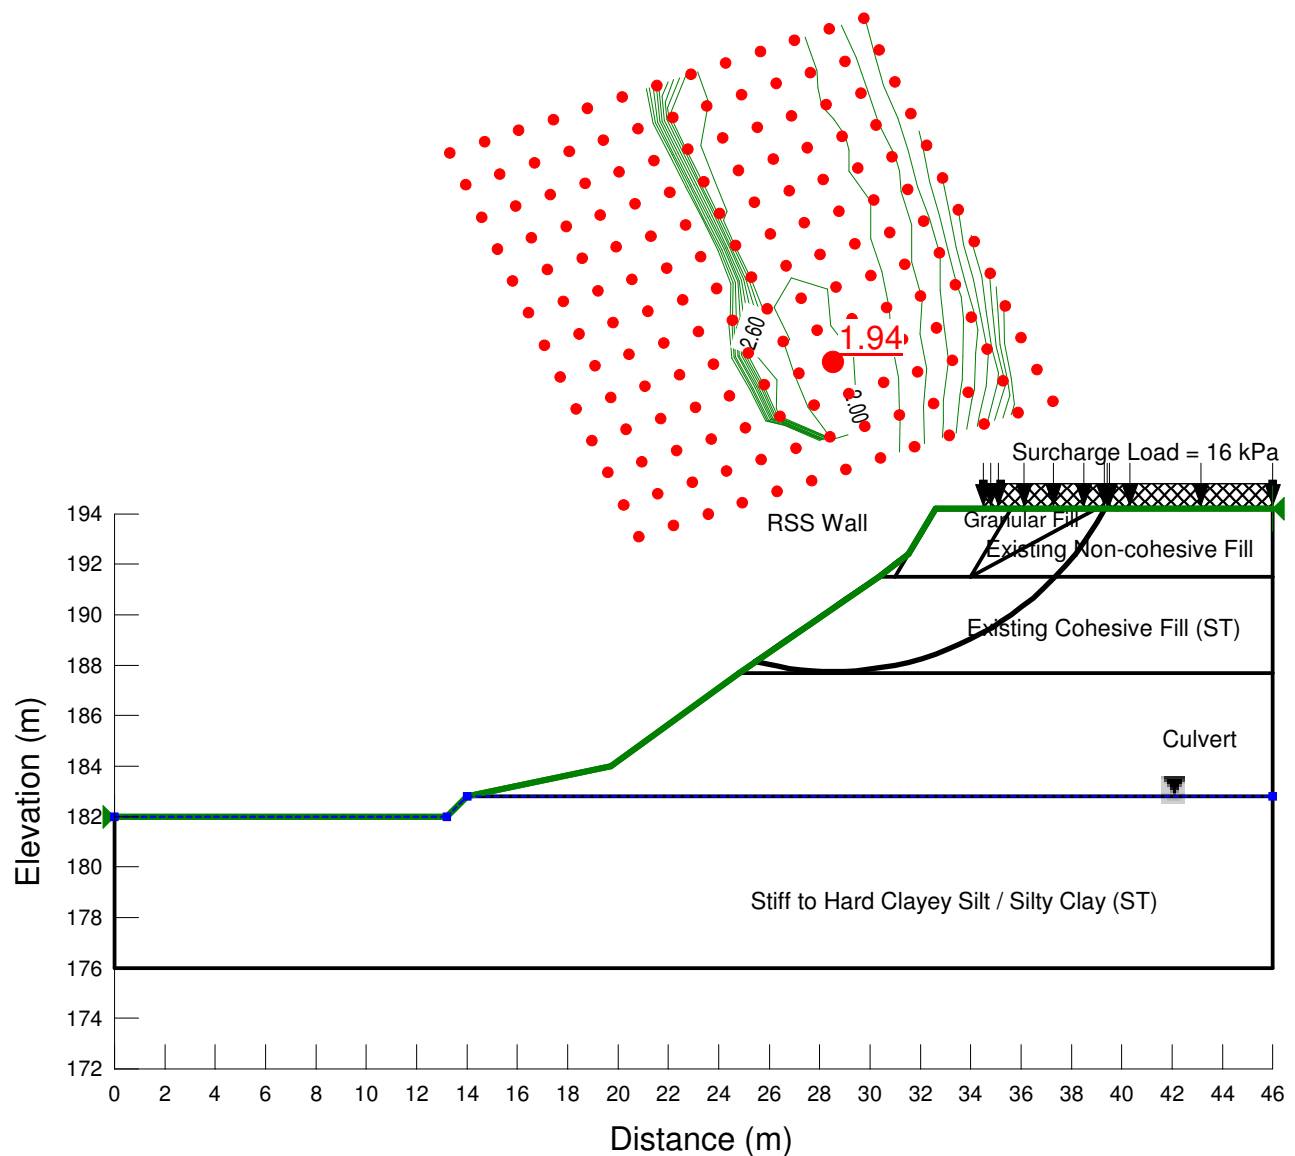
Slope Stability Analysis with Proposed RSS Wall, at culvert - Sta. 15+205
